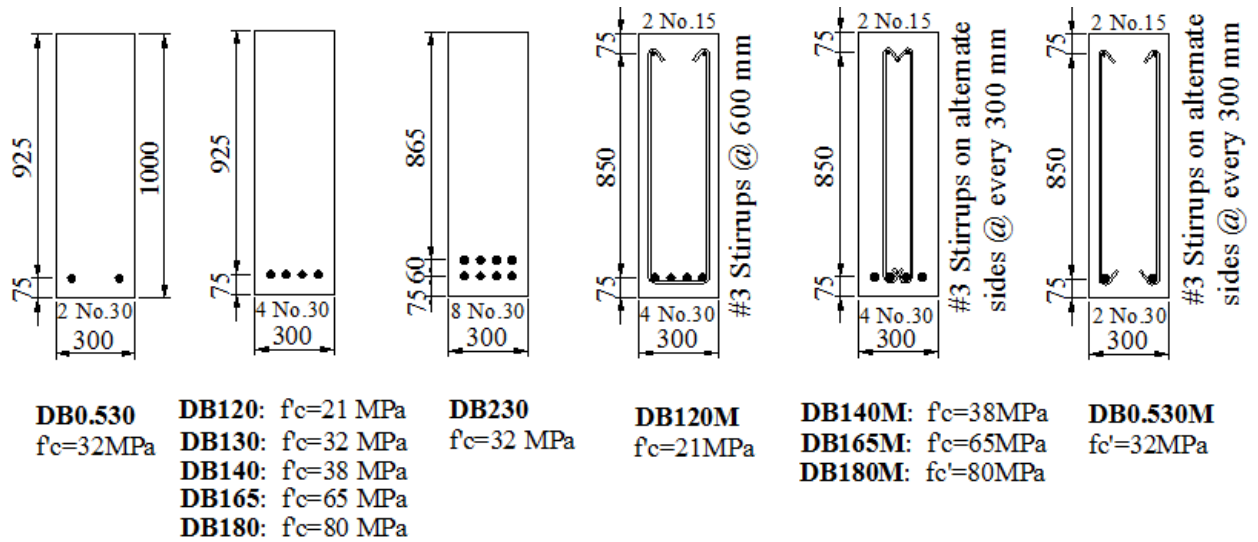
Cross Section Details and Concrete Strengths for Angelakos Beams
